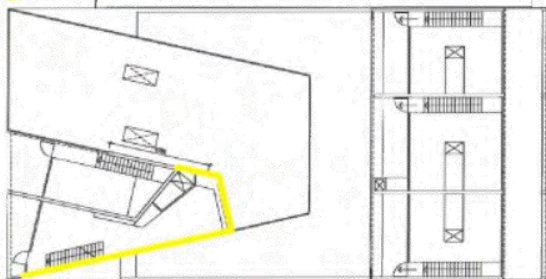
Locations for Alternative Exterior Framed Wall Construction (Indicated in Yellow)
